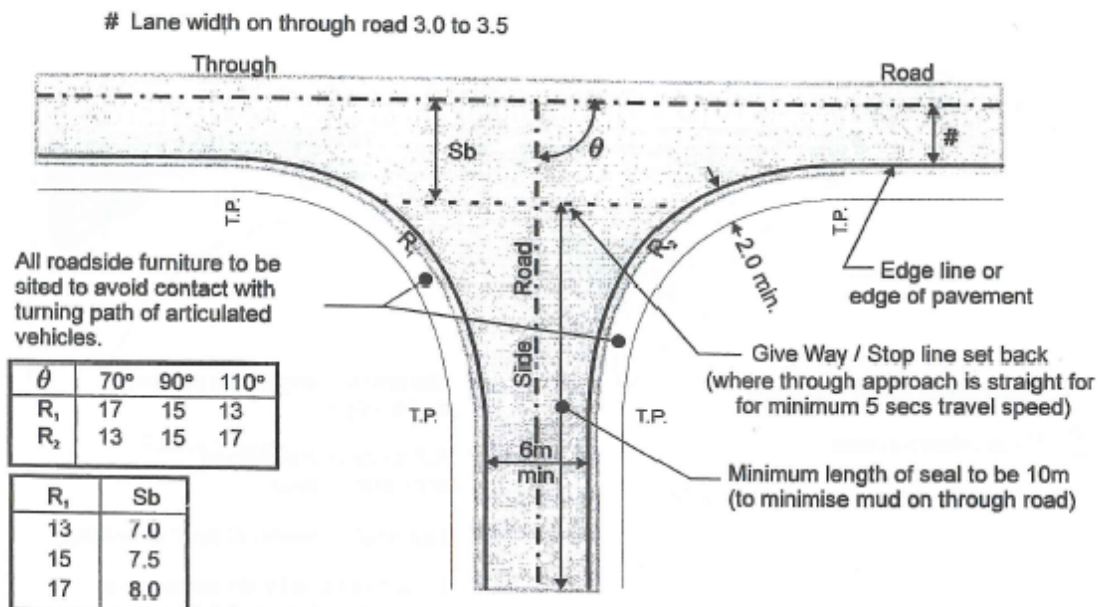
Details of Type "BAL" Layout for Rural Sites where Side Road AADT < 50.
